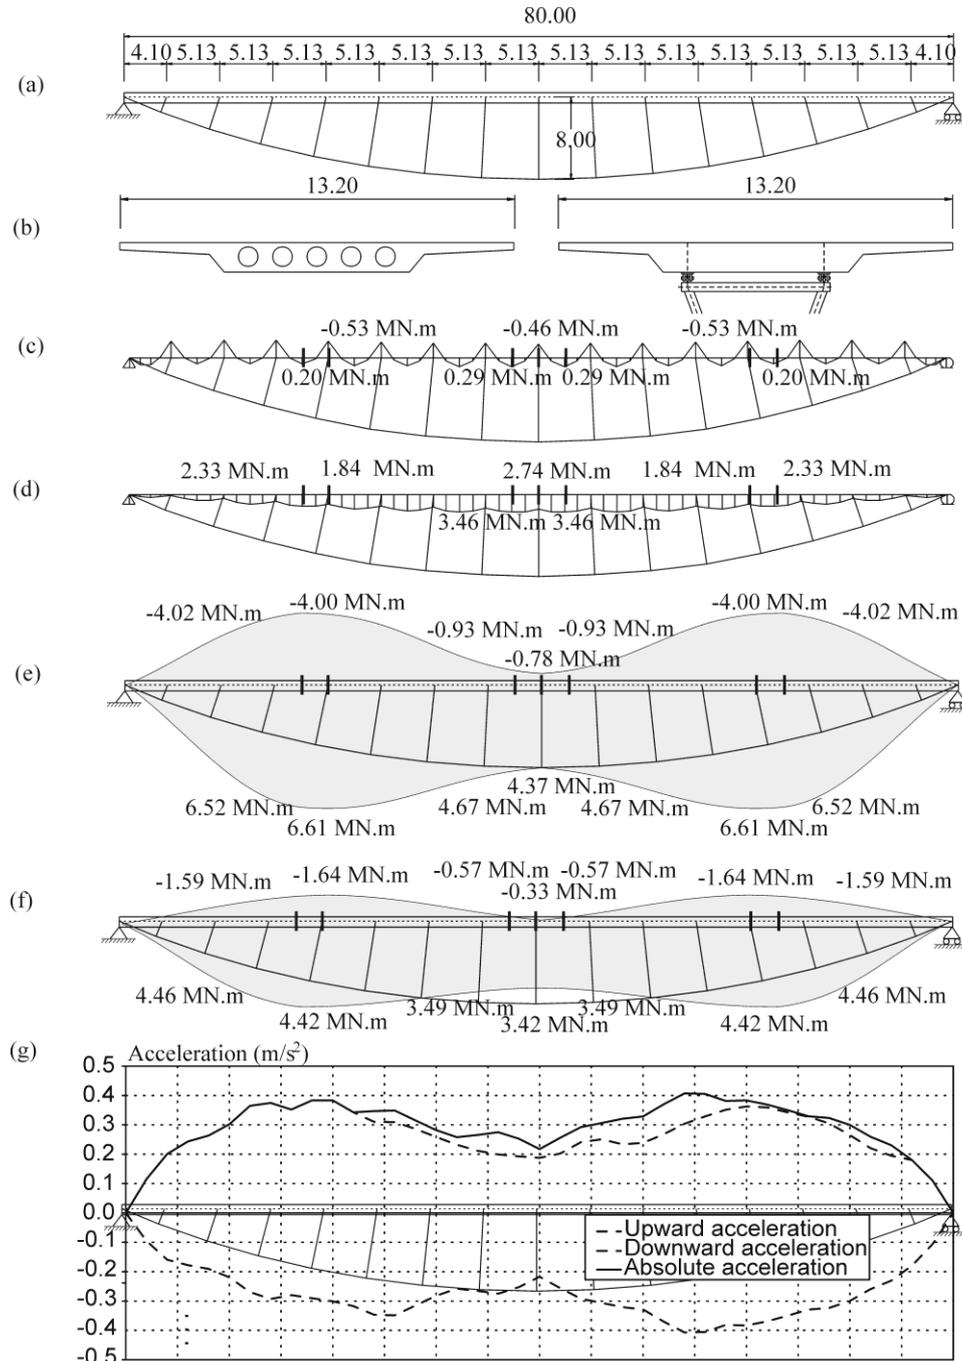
Diagrams in an 80 m span under-deck cable-stayed bridge with multiple struts: (a) Elevation of the bridge; (b) cross-sections of the deck; (c) bending moment diagram in permanent state due to self-weight (184.86 kN/m), superimposed dead load (43.10 kN/m) and prestressing of stay cables; (d) bending moment diagram in permanent state due to self-weight, superimposed dead load, prestressing of stay cables, concrete shrinkage, concrete creep and relaxation of the internal prestressing; (e) bending moment envelope due to a uniform distributed traffic live load equal to 52.8 kN/m (4 kN/m²); (f) bending moment envelope due to a point traffic live load equal to 600 kN; (g) envelope of vertical accelerations due to the passage, from the left to the right abutment, of two vehicles of 400 kN at 60 km/h
